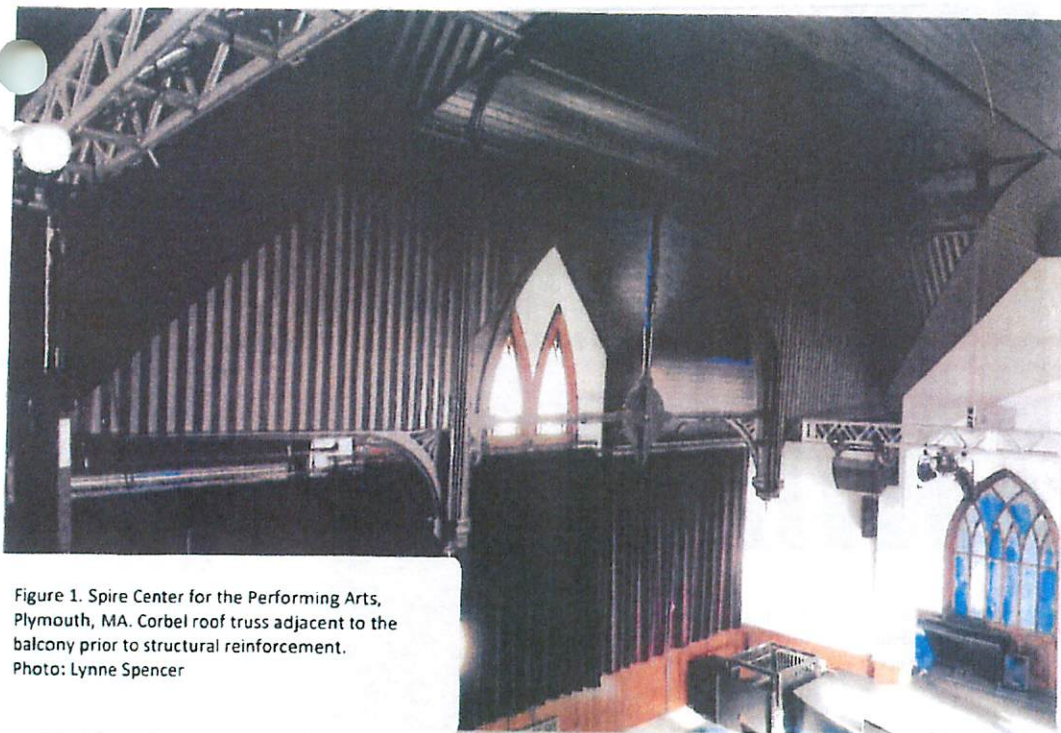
Spire Center for the Performing Arts, Plymouth, MA. Corbel roof truss adjacent to the balcony prior to structural reinforcement.
